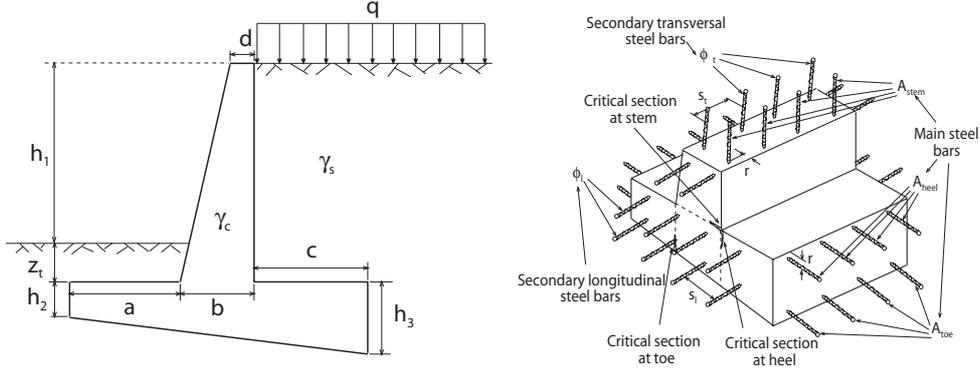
Geometrical description of the wall and details of the bar reinforcement.
